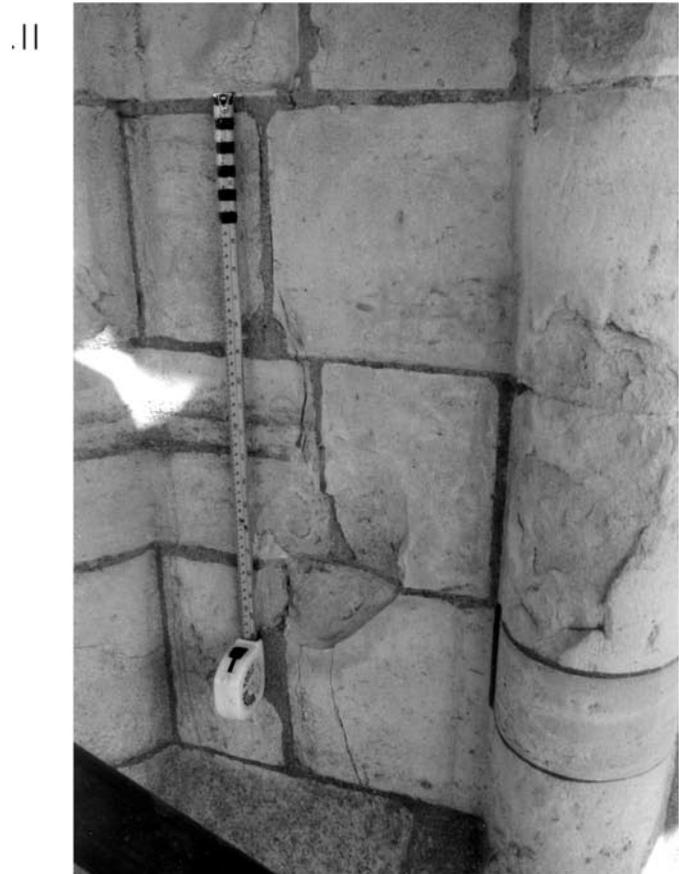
GLOUCESTER CATHEDRAL SOUTH TRANSEPT ~ WEST ELEVATION
